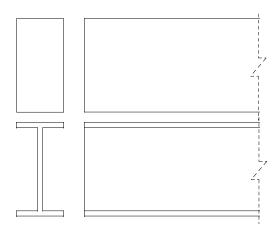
Rectangular Concrete Girder and Steel I-Girder Section and Elevation
